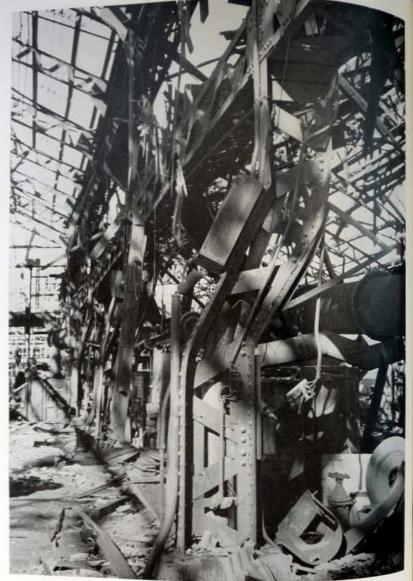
,-5,000 feet from GZ. Group 4. Building 5. North row of columns, looking west.
